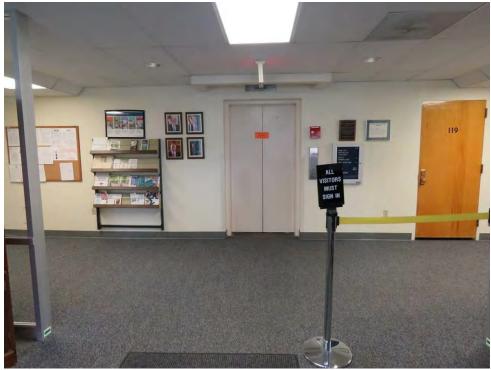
Columbia Basin Project Irrigation Division Headquarters Office – View in first floor lobby looking east.
